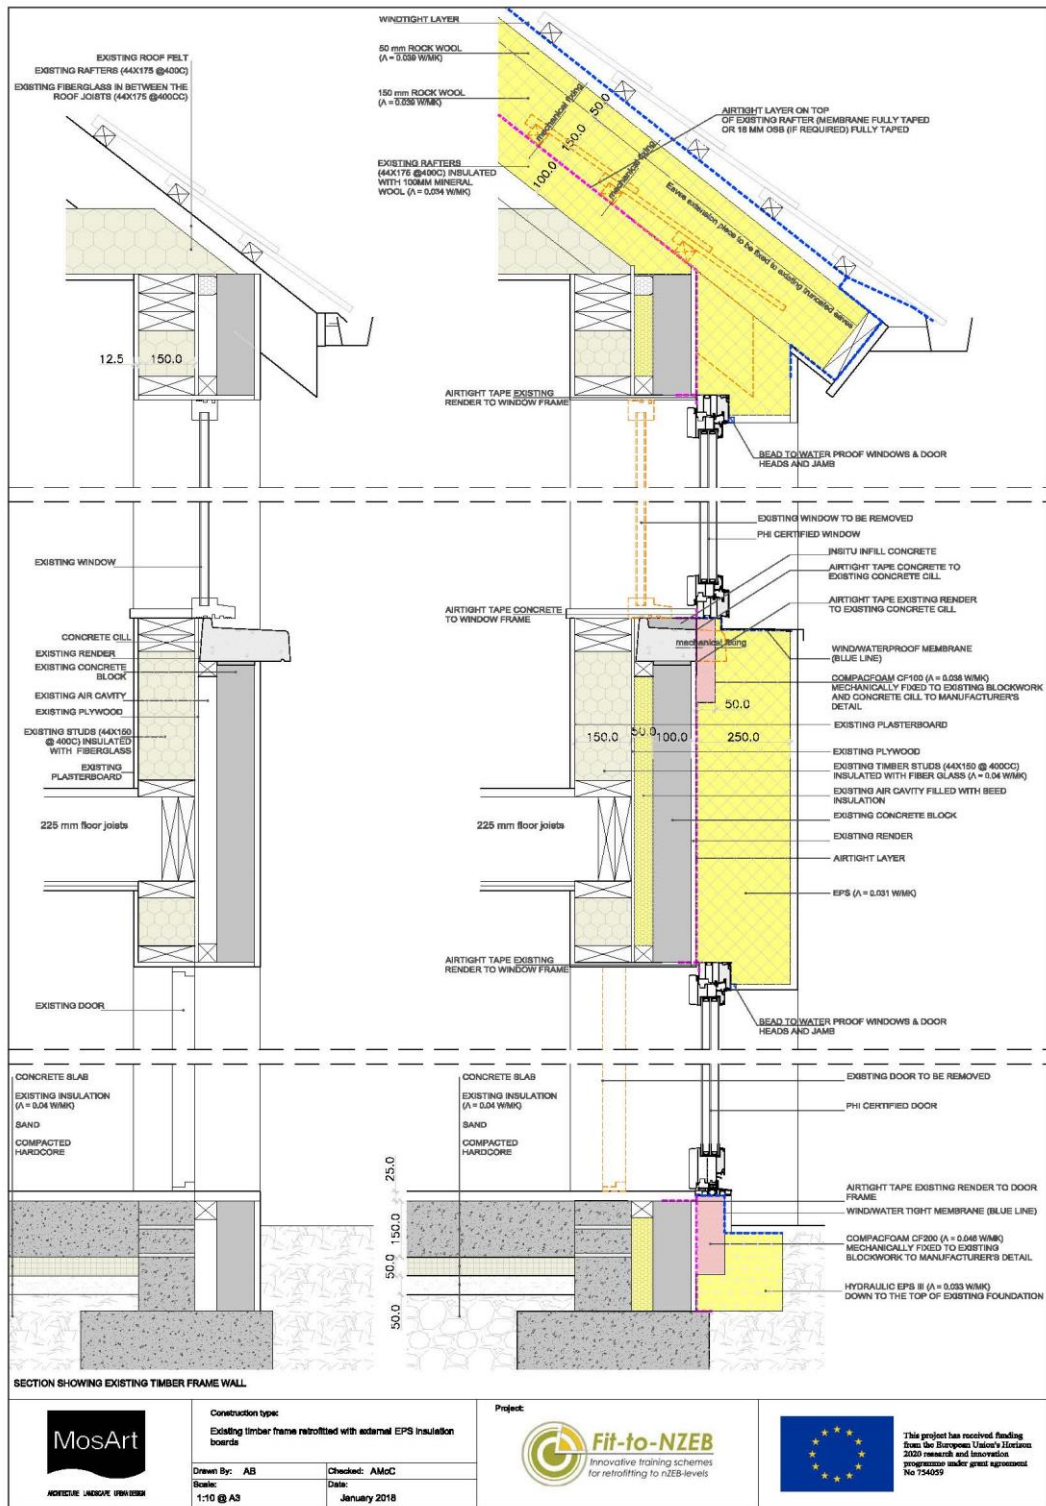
Upgrading a timber frame wall which retains the external block leaf, fills the external ventilated cavity with insulation and applies an external insulation finishing system to the block leaf
